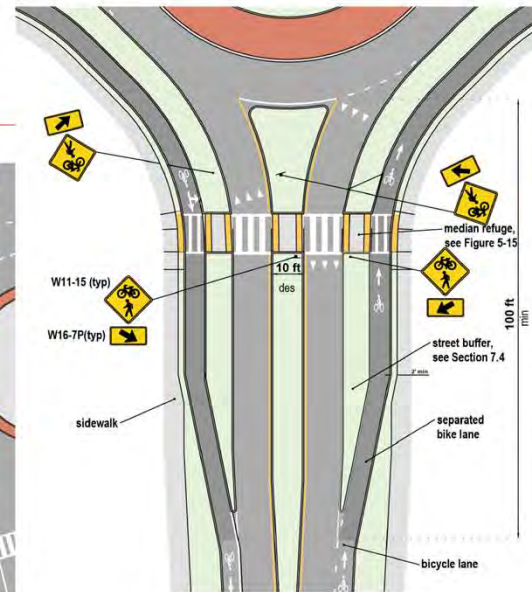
Typical Layout of Separated Bike Lanes at Roundabout
